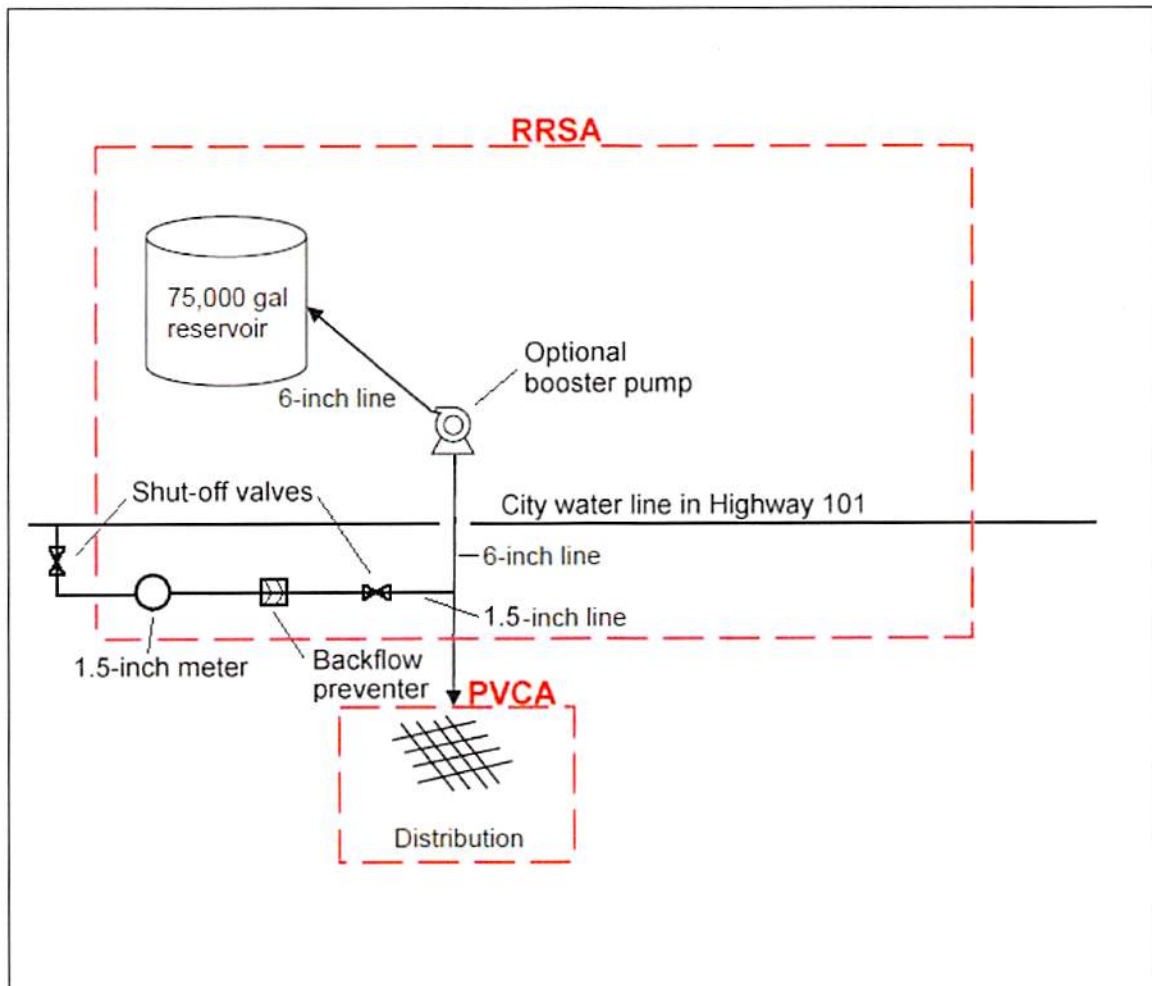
Conceptual Layout for RRSA Connection to City Water
